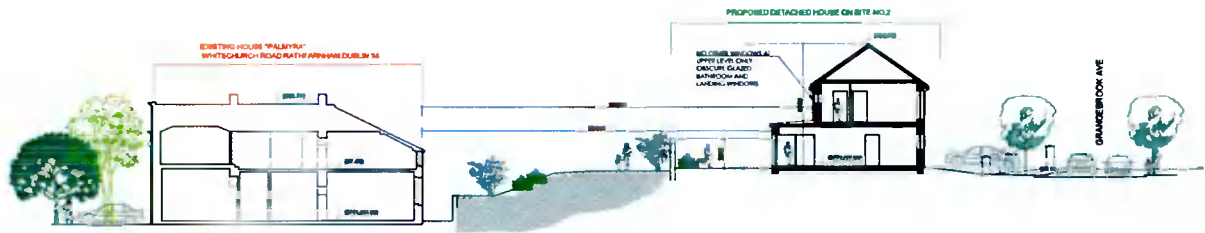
Site section through House No 2 and Palmyra, looking southwards.
